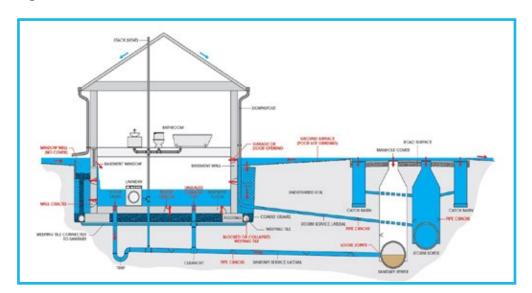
Stormwater Overflow into Streets and Homes
